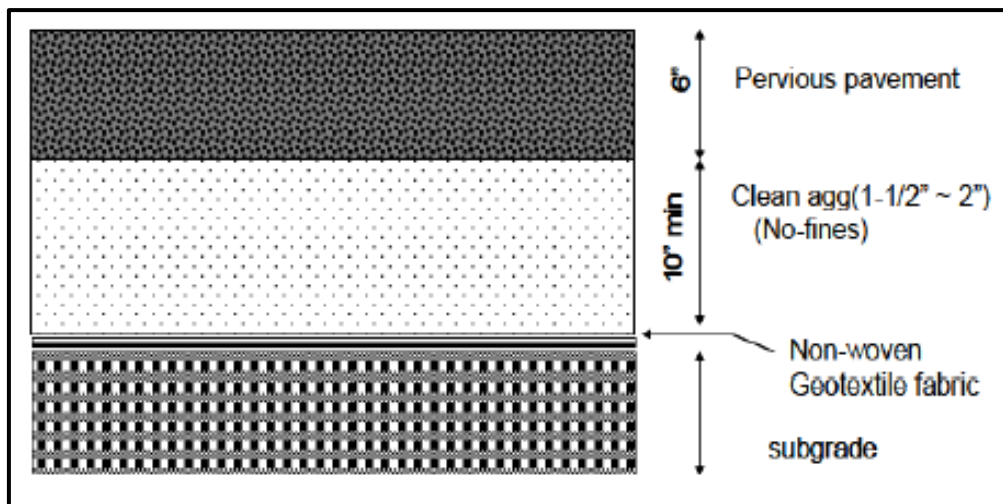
Pervious concrete design for heavy traffic (Tong, 2011)
